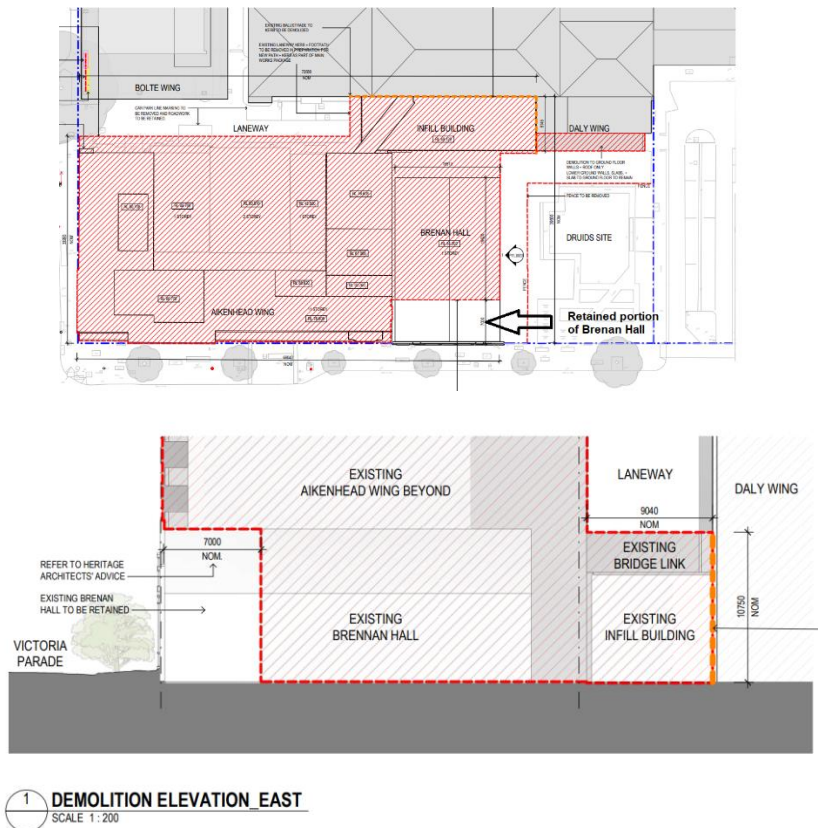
Site plan and east elevation showing the demolition of the Aikenhead building and partial extent of demolition of the Brennan Hall approved under Planning Permit PLN20/0567.
